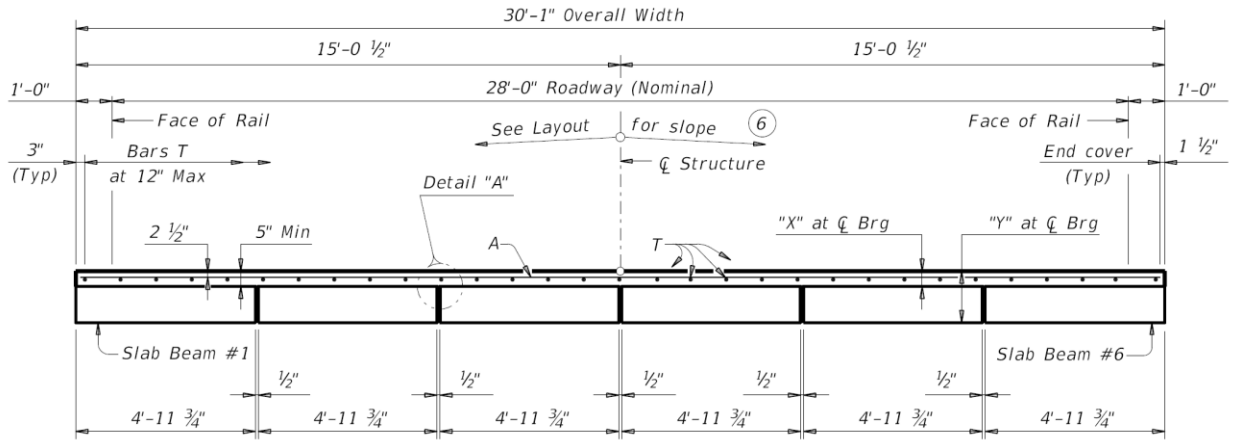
Typical Bridge Cross-Section Using 5SB15 Slab Beams (TxDOT 2019).
